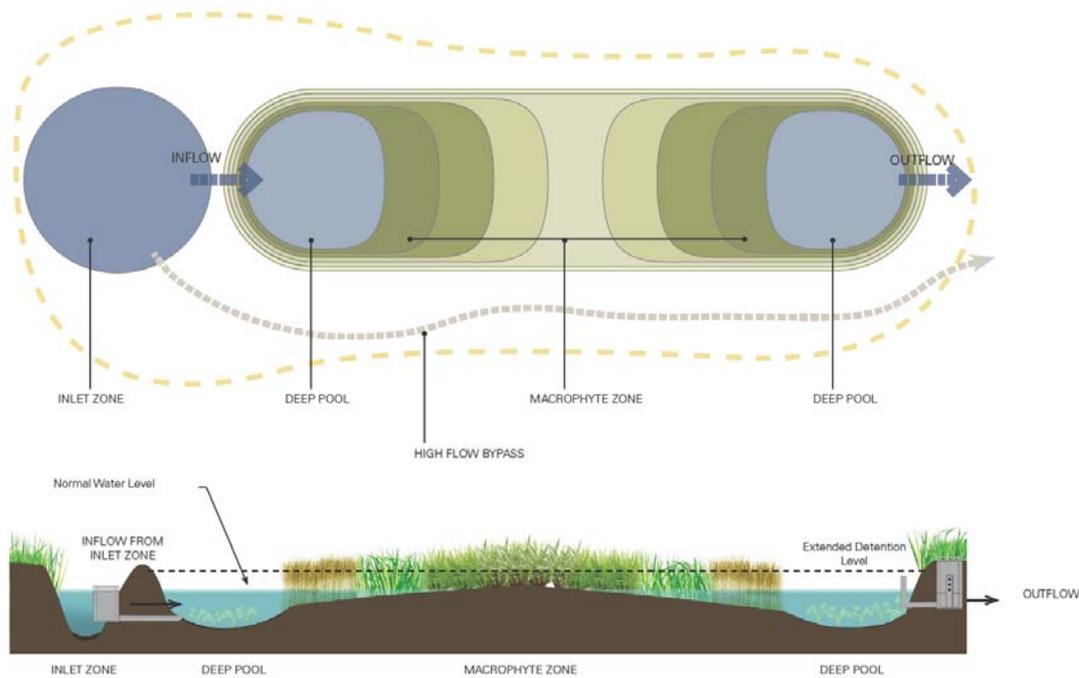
Typical plan and long section of a constructed stormwater wetland
